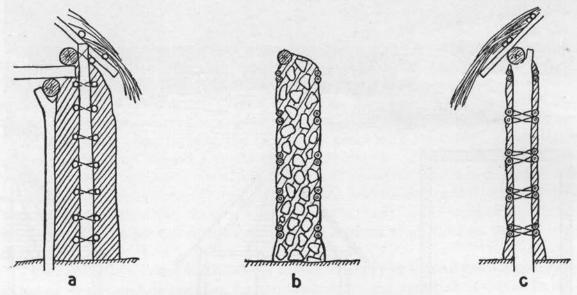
CANE AND MASS ADOBE WALL CONSTRUCTION
